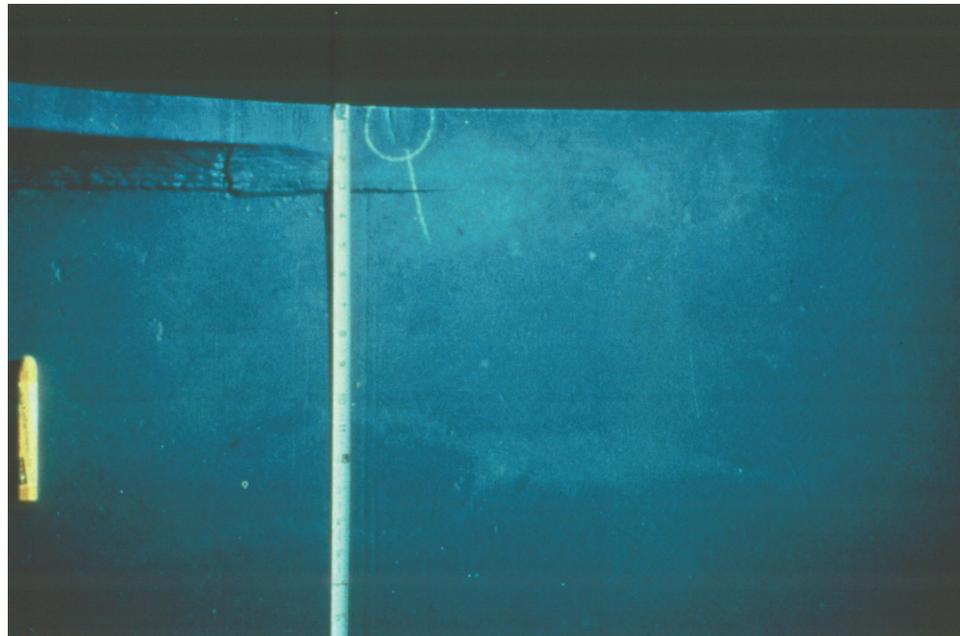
Insufficiently Ground Flame Cut of Gusset Plate for Arch to Tie Girder Connection
